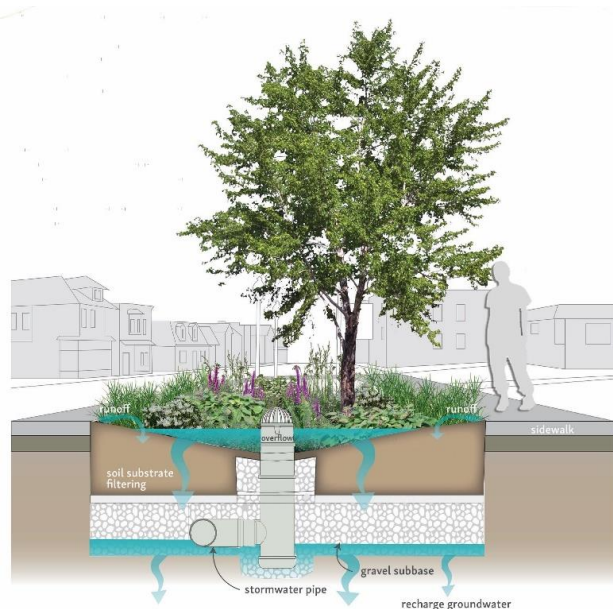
Rain garden section illustration showing green infrastructure developed for the Albany Pool.
